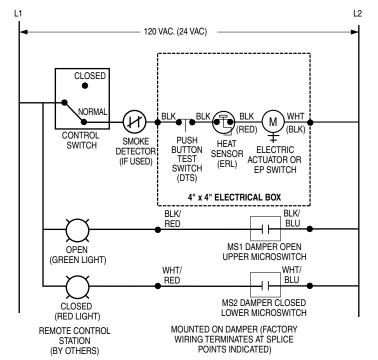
DTS/ERL with MLS-300 (Honeywell) Position Indicator Package (rotary cam type)
